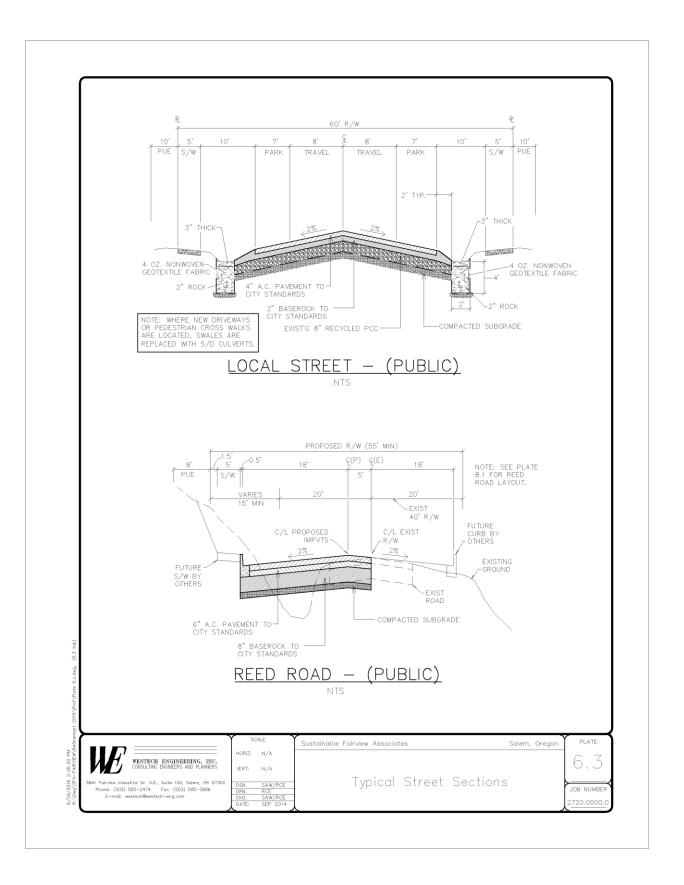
shows the types and locations of the new streets. Typical cross sections of streets are shown on plates 6.1-6.4
